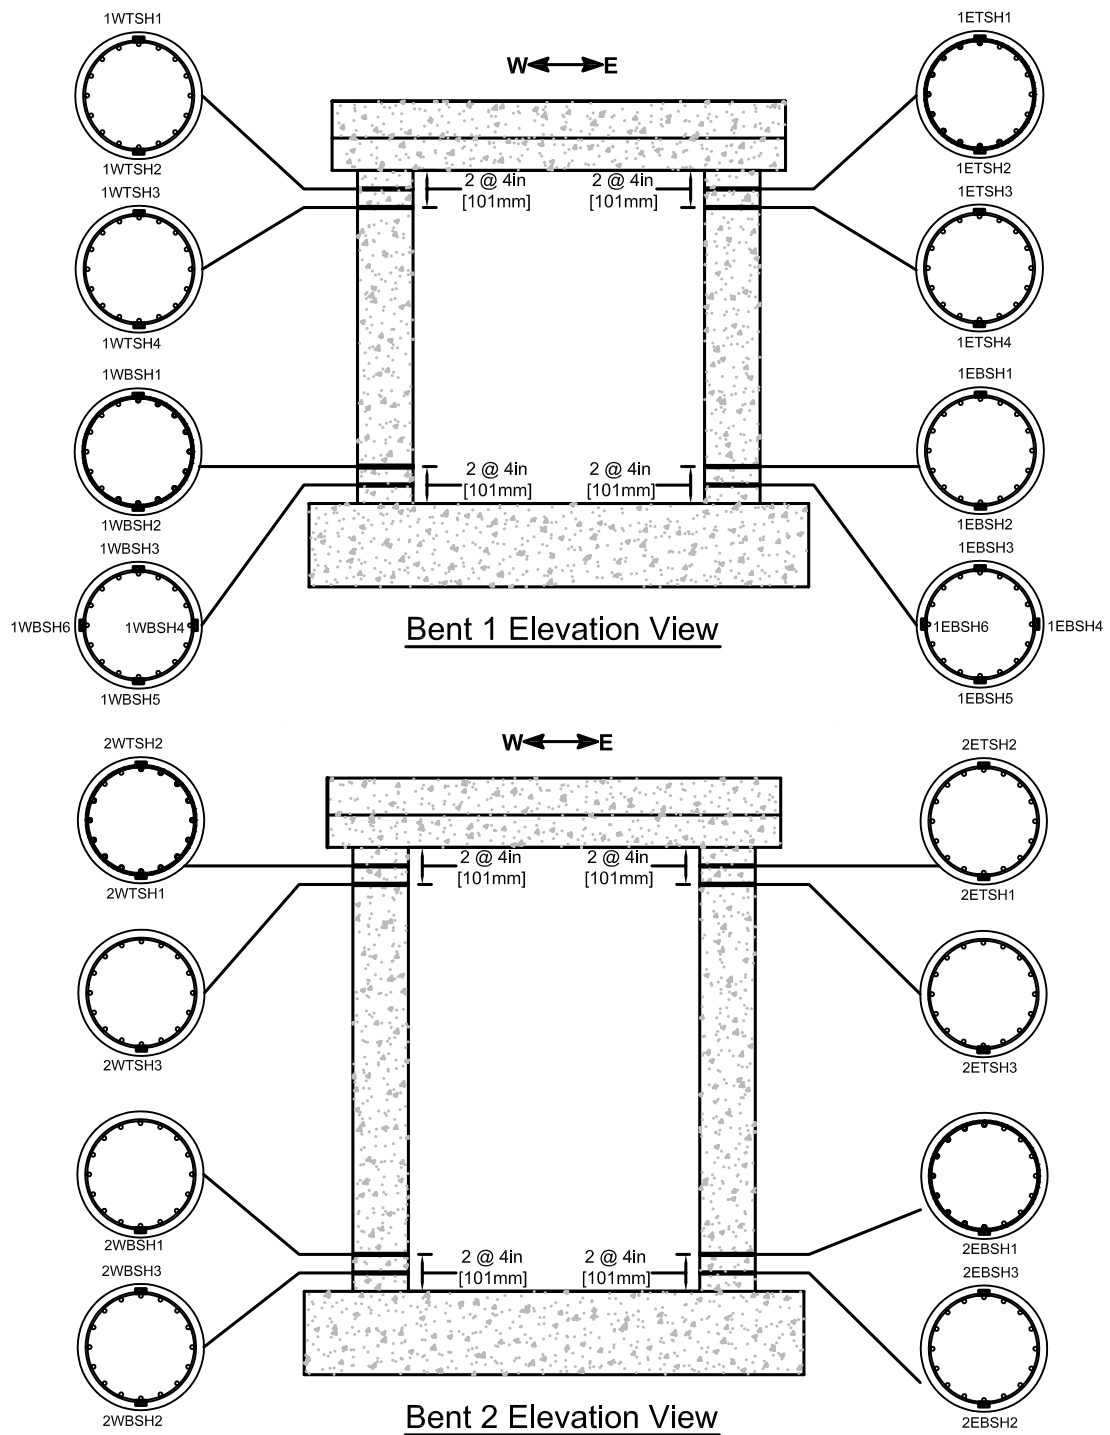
Instrumentation plans sheet 5 of 8; Bent 1 & 2 transverse strain gauges.
